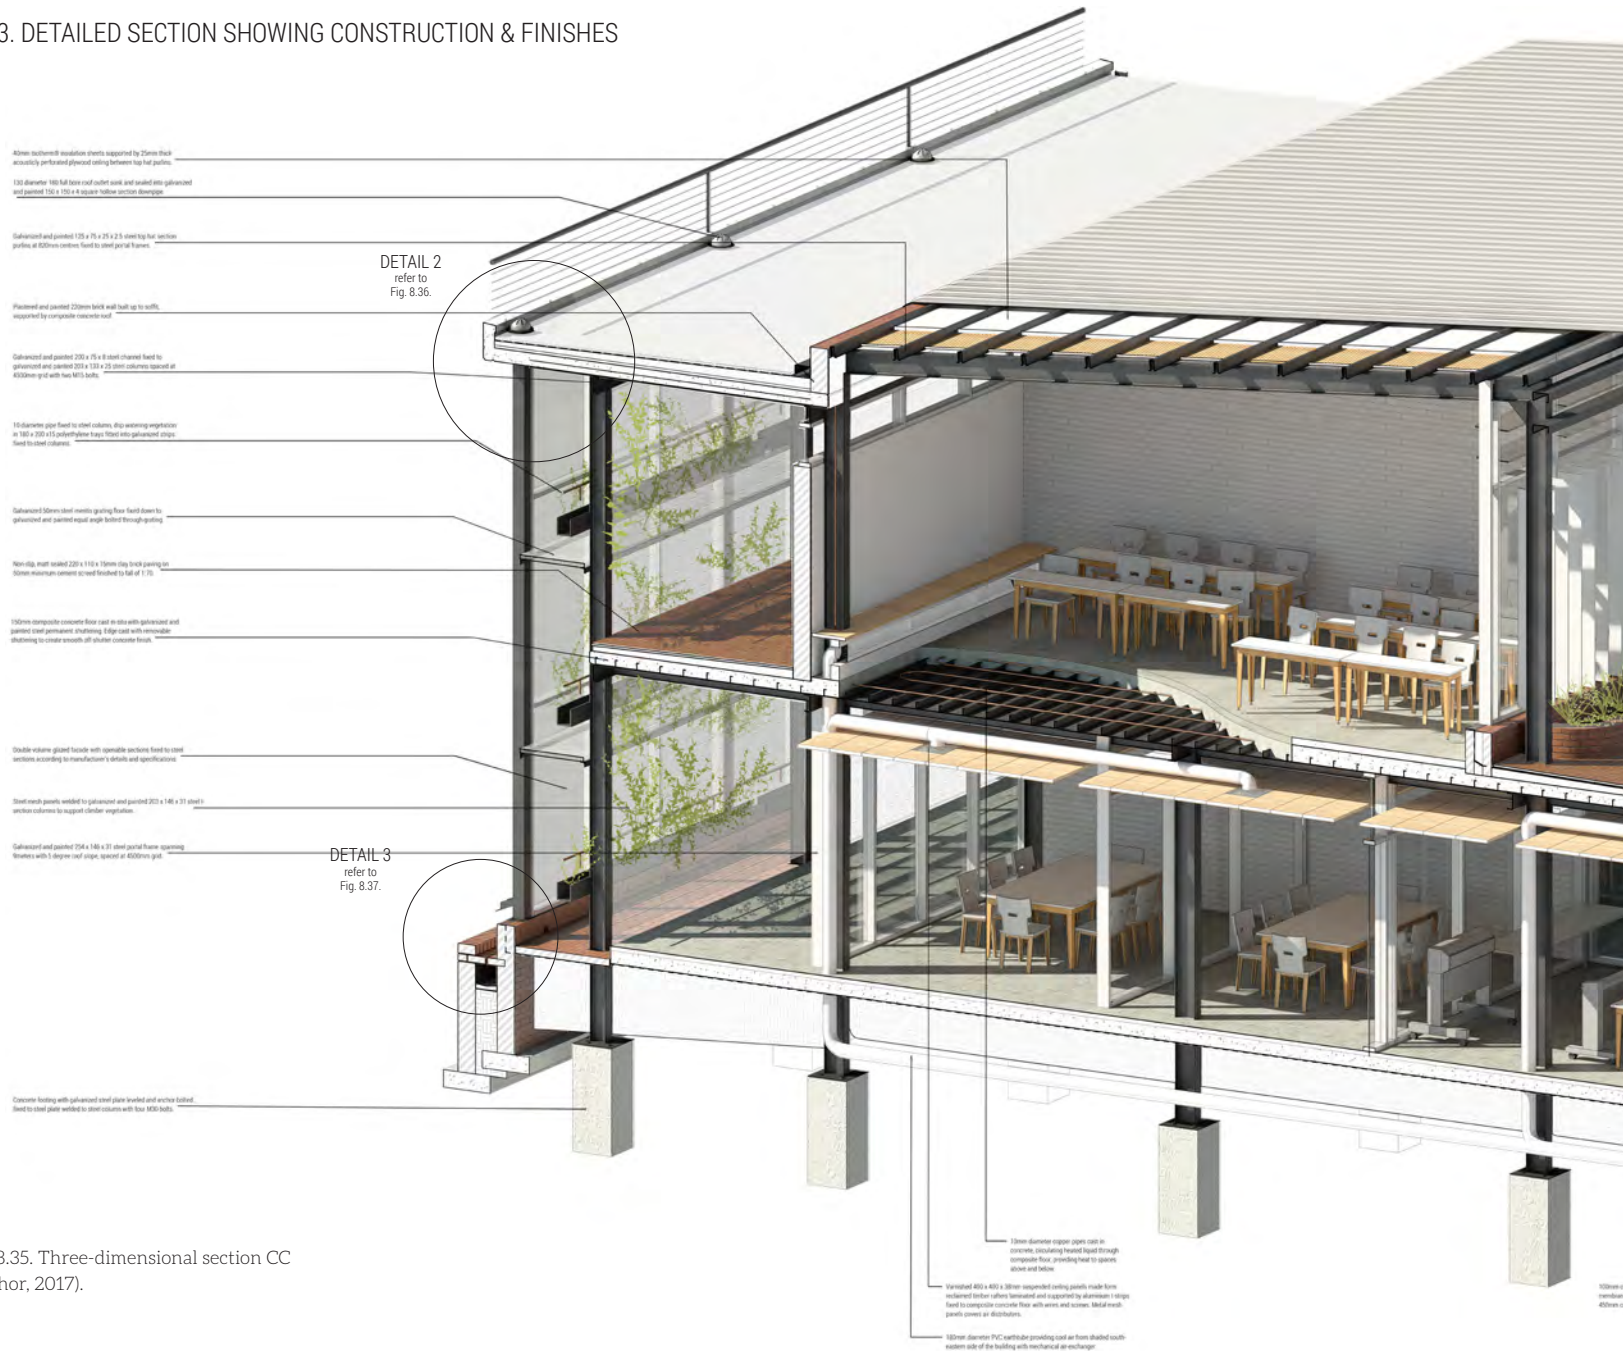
Three-dimensional section CC (Author, 2017).
